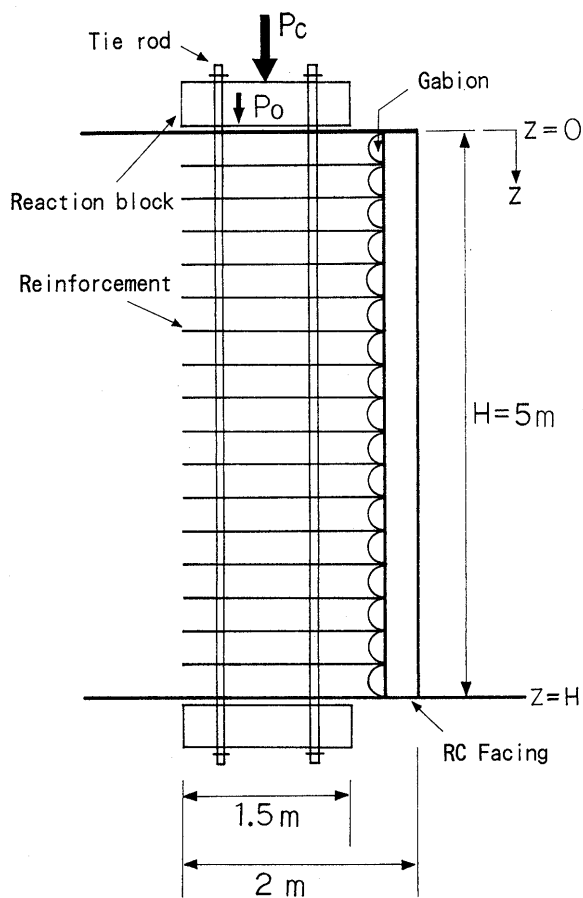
A model preloaded/prestressed geosynthetic-reinforced gravel retaining wall
